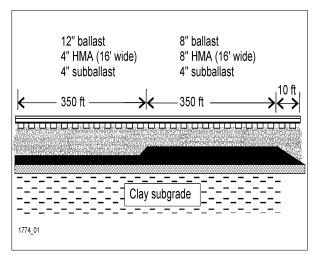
Longitudinal Cross Section of HMA Test Track
